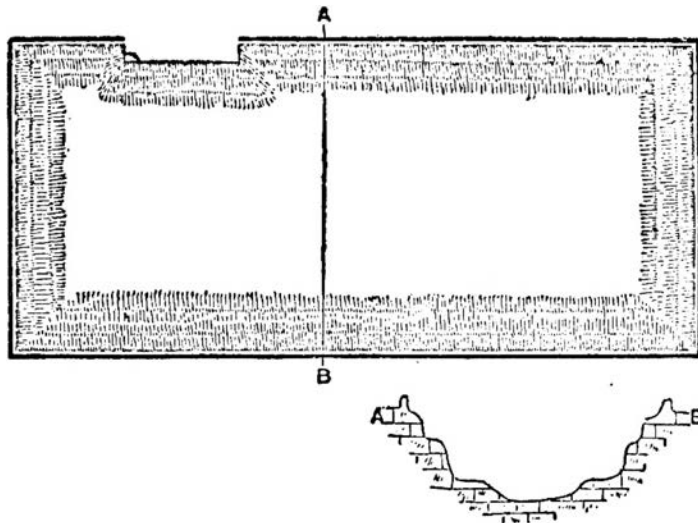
Plan view and cross section of the water reservoir inside the “Tschudi” palace, Chan Chan (Squier, 1877)
